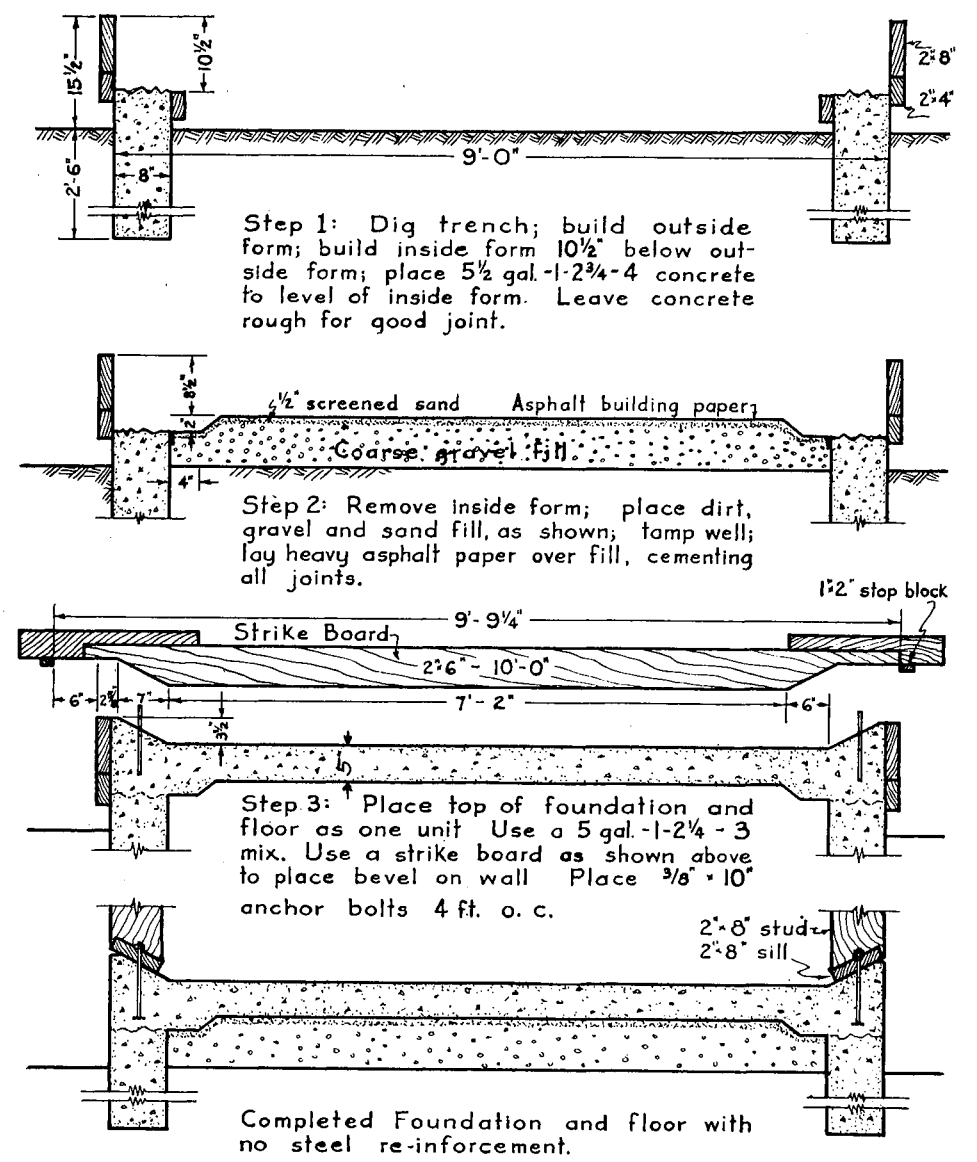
CONCRETE FLOOR AND FOUNDATION
